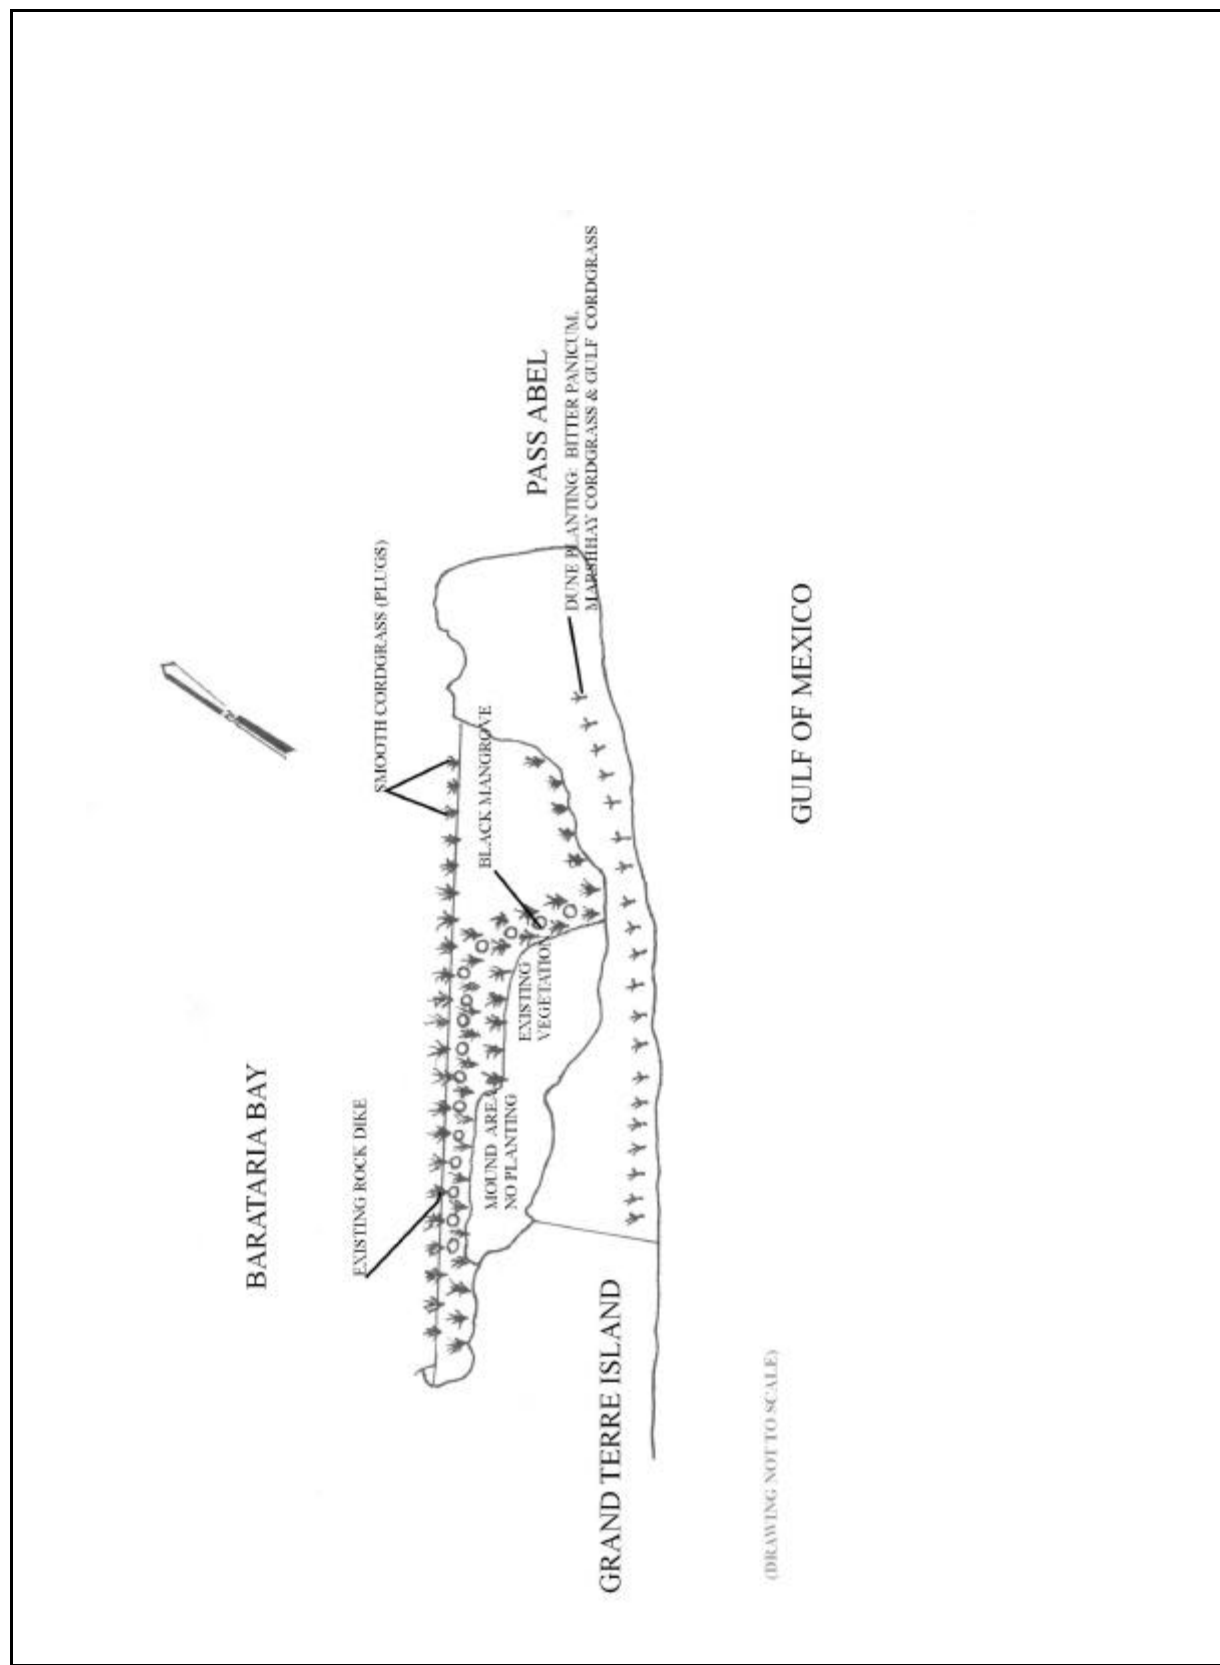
Plan view of planting layout for Vegetative Planting of Dredge Material Disposal Site on Grand Terre (BA-28) project.
